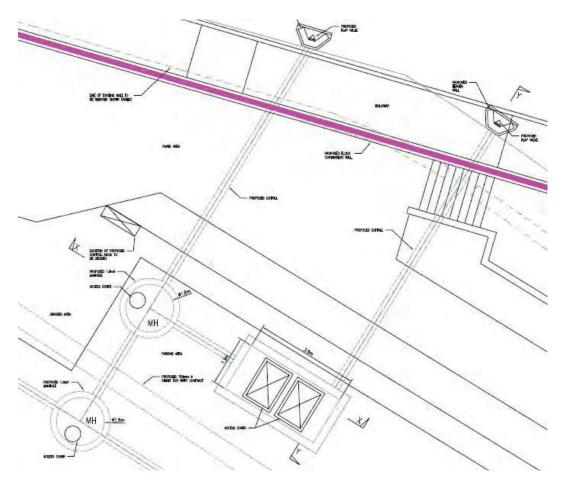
Typical pump station layout plan along River Walk. Extracted from Drawing No 1056. Not to Scale.
